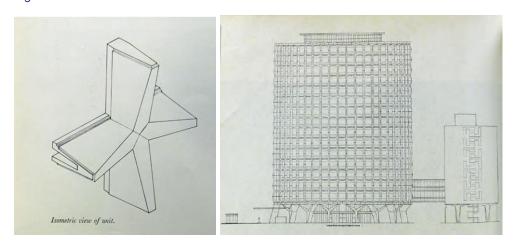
Isometric View of Unit, Concrete Quarterly 1967, Space House South Elevation, 1968
